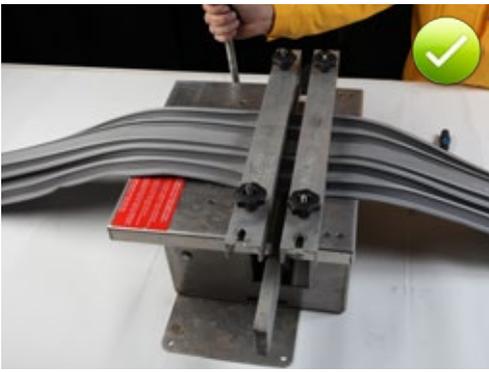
Pressing the molten waterbar ends together with the closing lever mechanism again after lowering the blade
